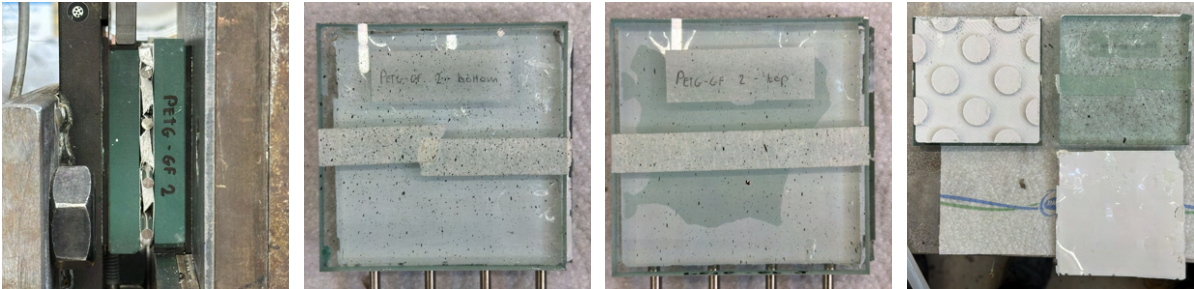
Specimen S10 — PETG-GF, Geometry 2 after testing
